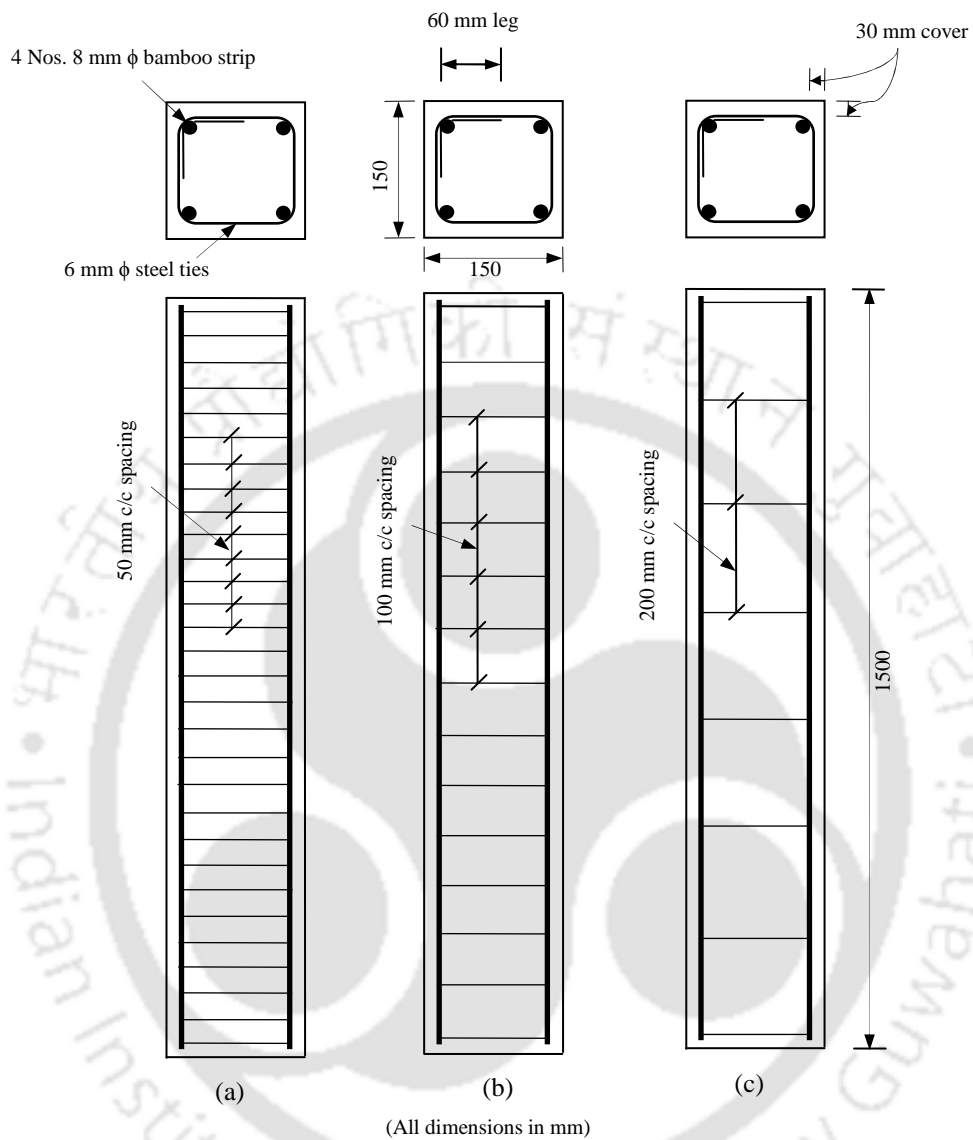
Reinforcement details of column with tie spacing: (a) 50 mm; (b) 100 mm; and (c) 200 mm.
